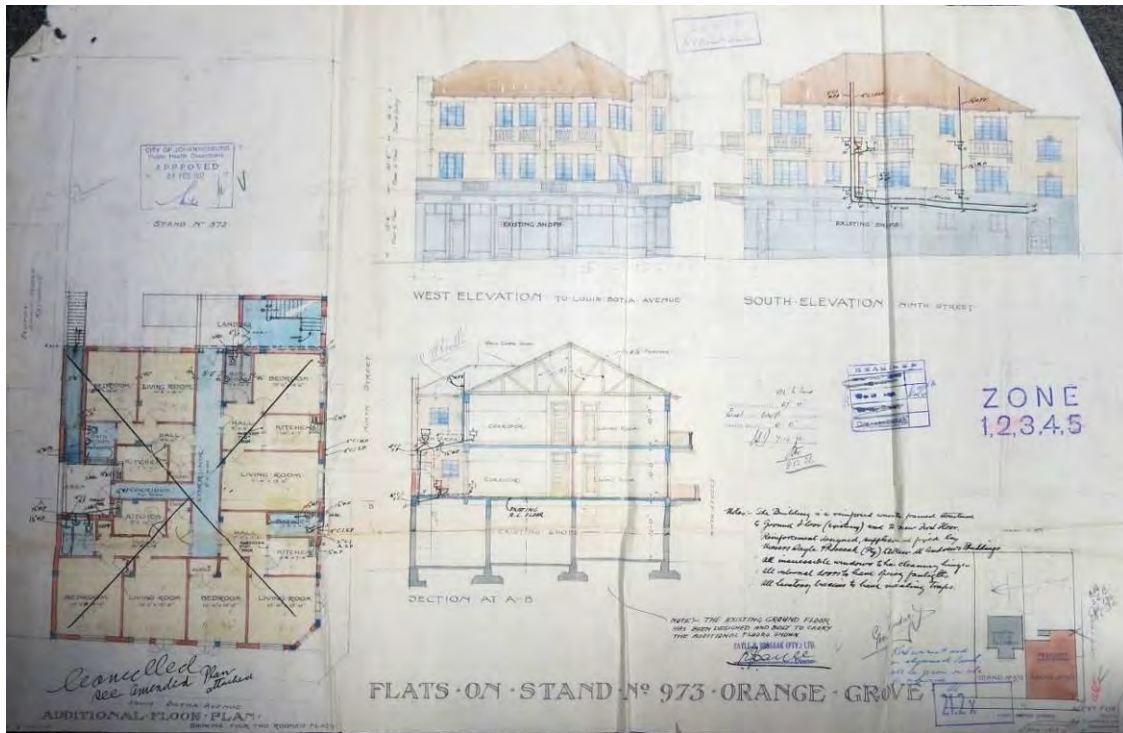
Original plan of proposed flats on stand 973, Orange Grove
